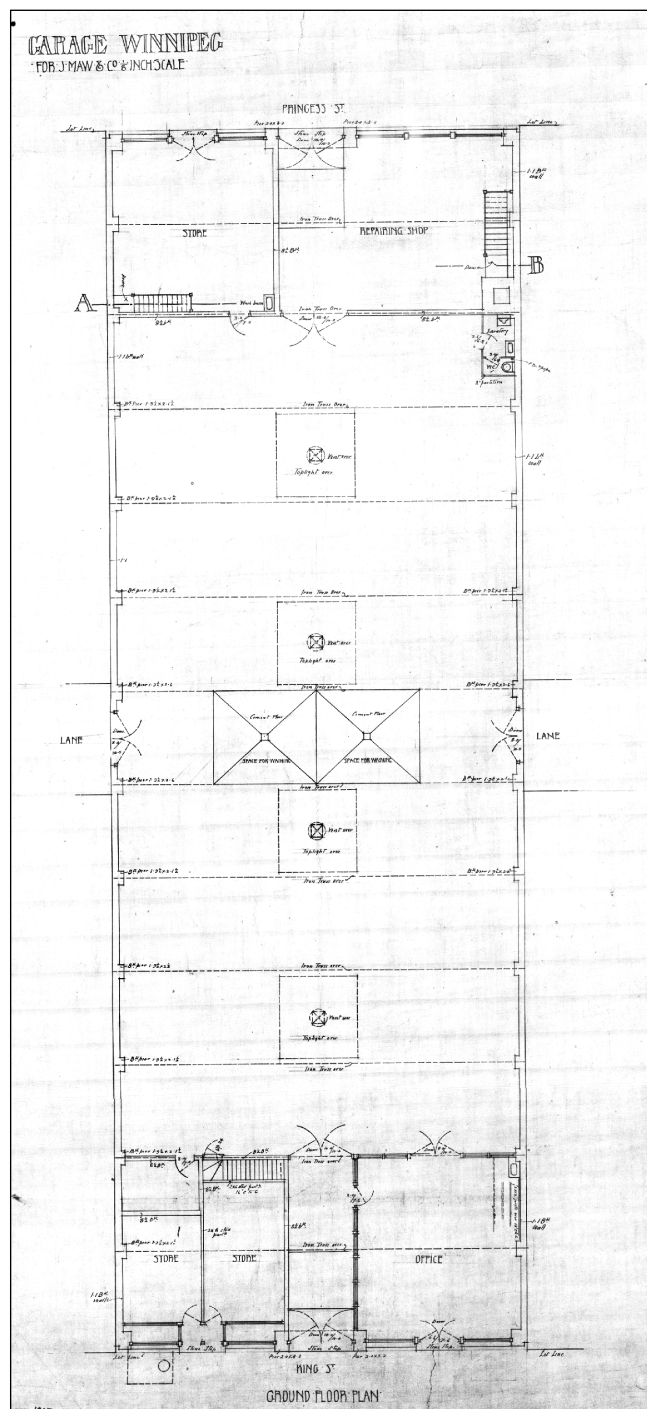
“Ground Floor Plan,” architect’s plans #176/1907. (City of Winnipeg, Records Management Division.)
